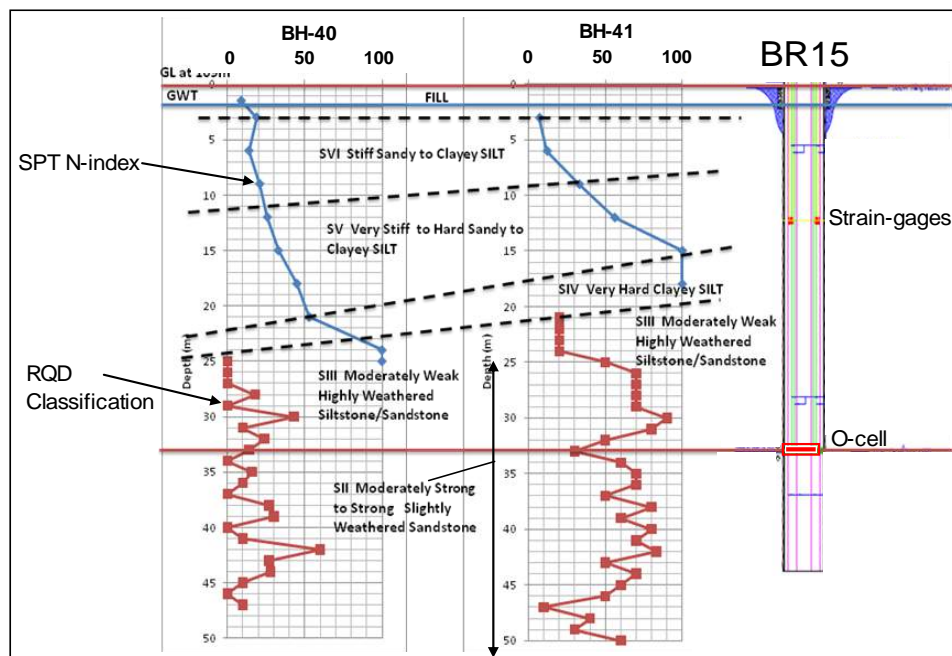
Jurong soil/rock profile near BR15 test barrette
